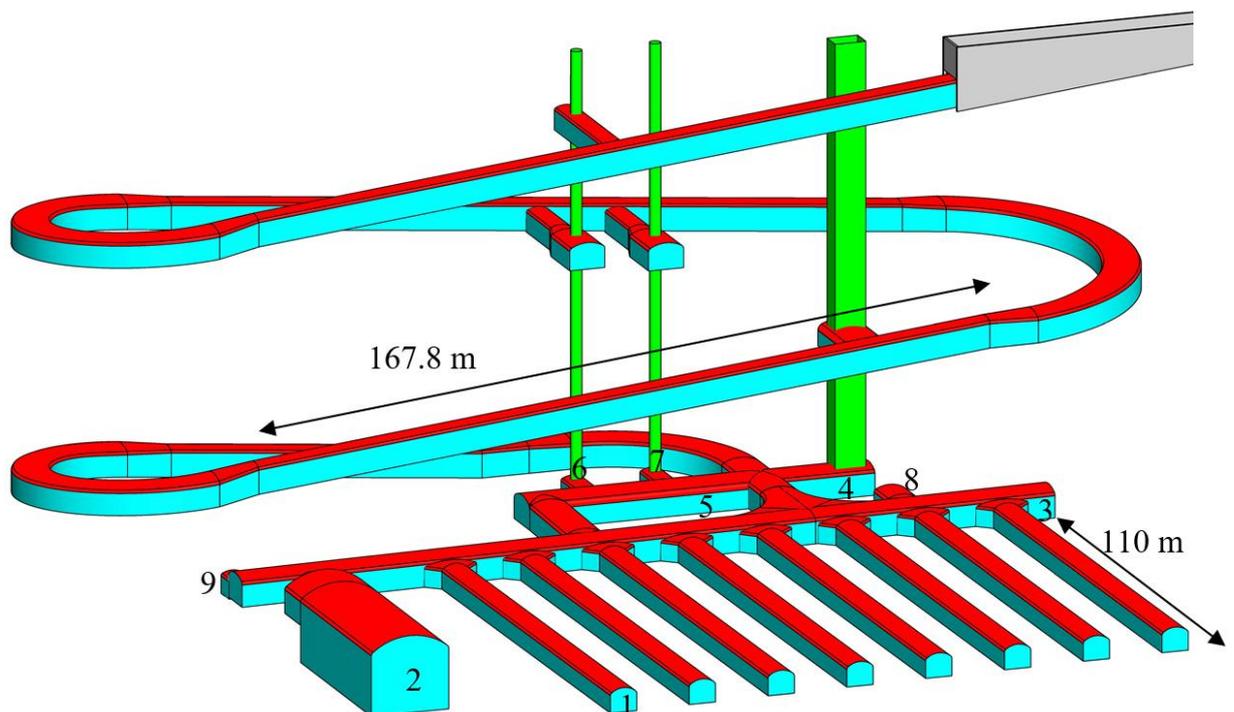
There will be eight VLLW/LLW halls (1) and one ILW hall (2) along the access tunnel and its side tunnel (3). Control and maintenance rooms (4) are located at the personnel shaft connection and parking hall (5) at the front of the inlet air shaft connection (6) and exhaust air shaft connection (7). There are also electrical rooms (8) and a sedimentation pool with a pumping station (9) at this intermediate depth repository level. The length of the straight basic access tunnel section is roughly 170 metres and VLLW/LLW hall 110 metres. Figure AINS.
